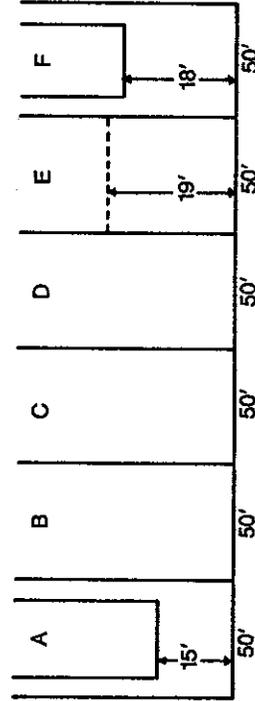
E Minimum required front yards, adjoining lots unimproved
